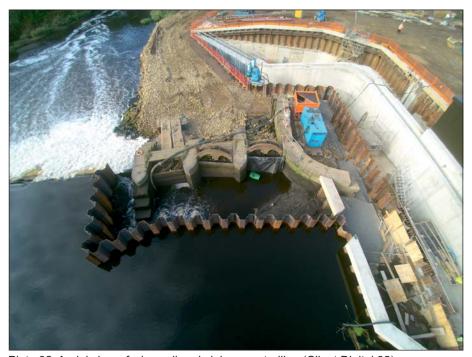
Aerial view of wingwall and sluices post-piling (Client Digital 32)
